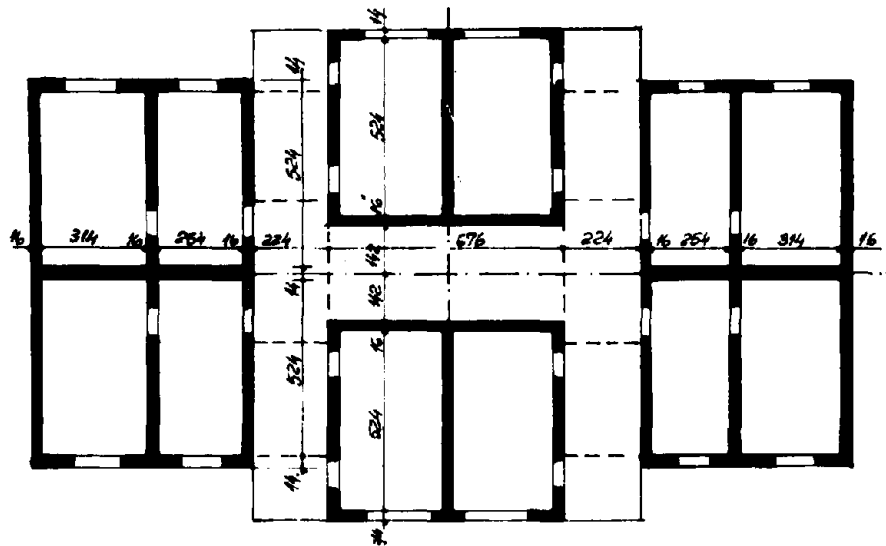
FLOOR PLAN OF TEN STORY BUILDING.
